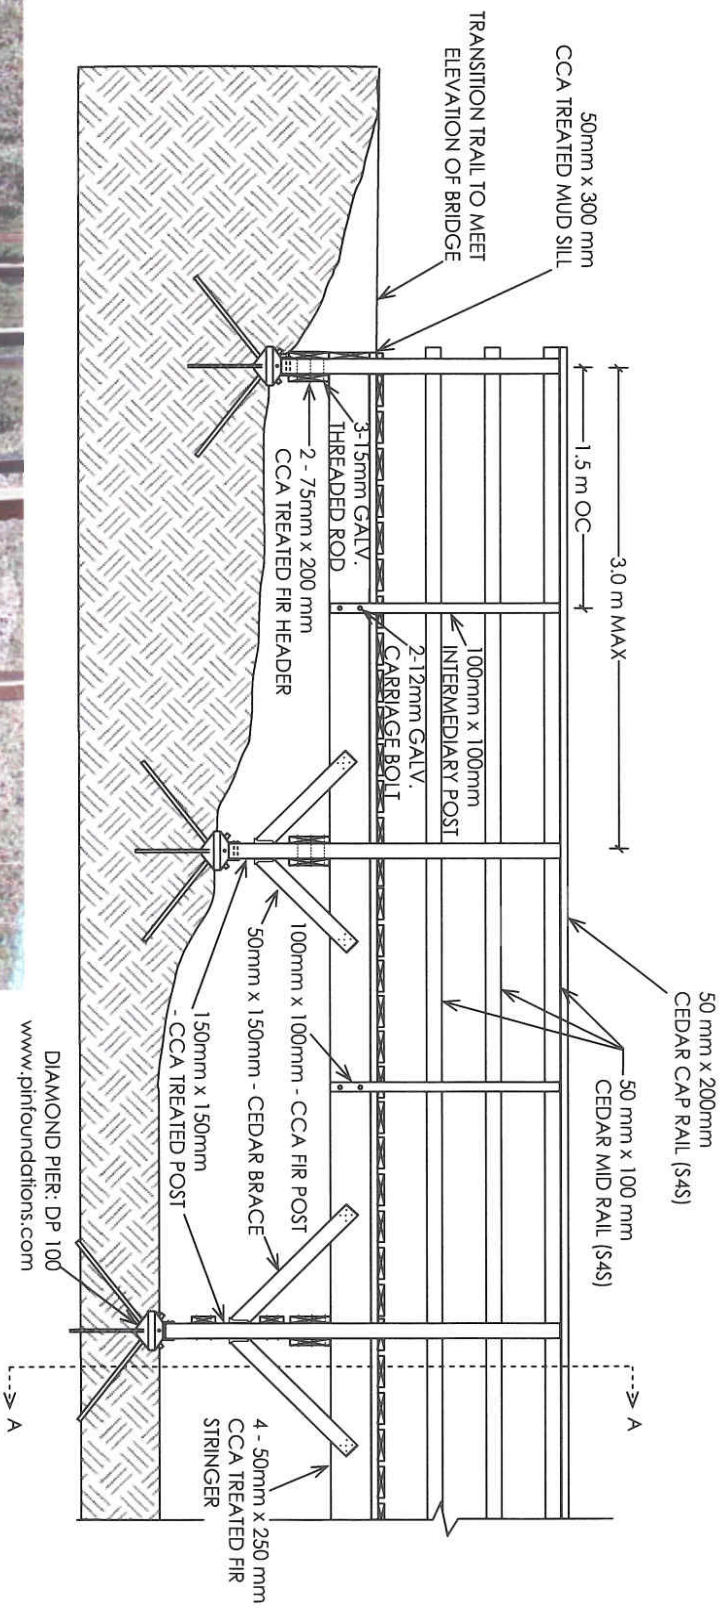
ELEVATED PEDESTRIAN BOARDWALK WITH DIAMOND PIERS
